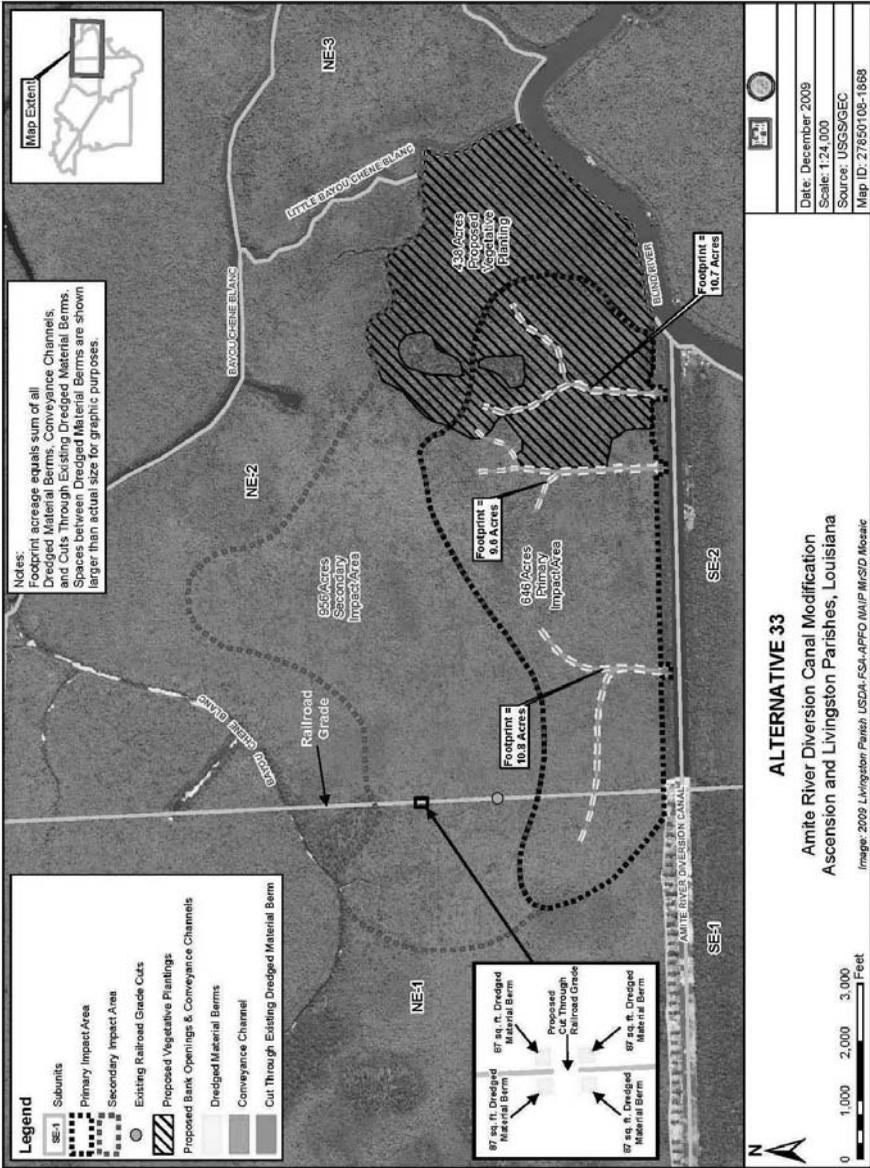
LCA ARDC Modification recommended plan (Alternative 33)
